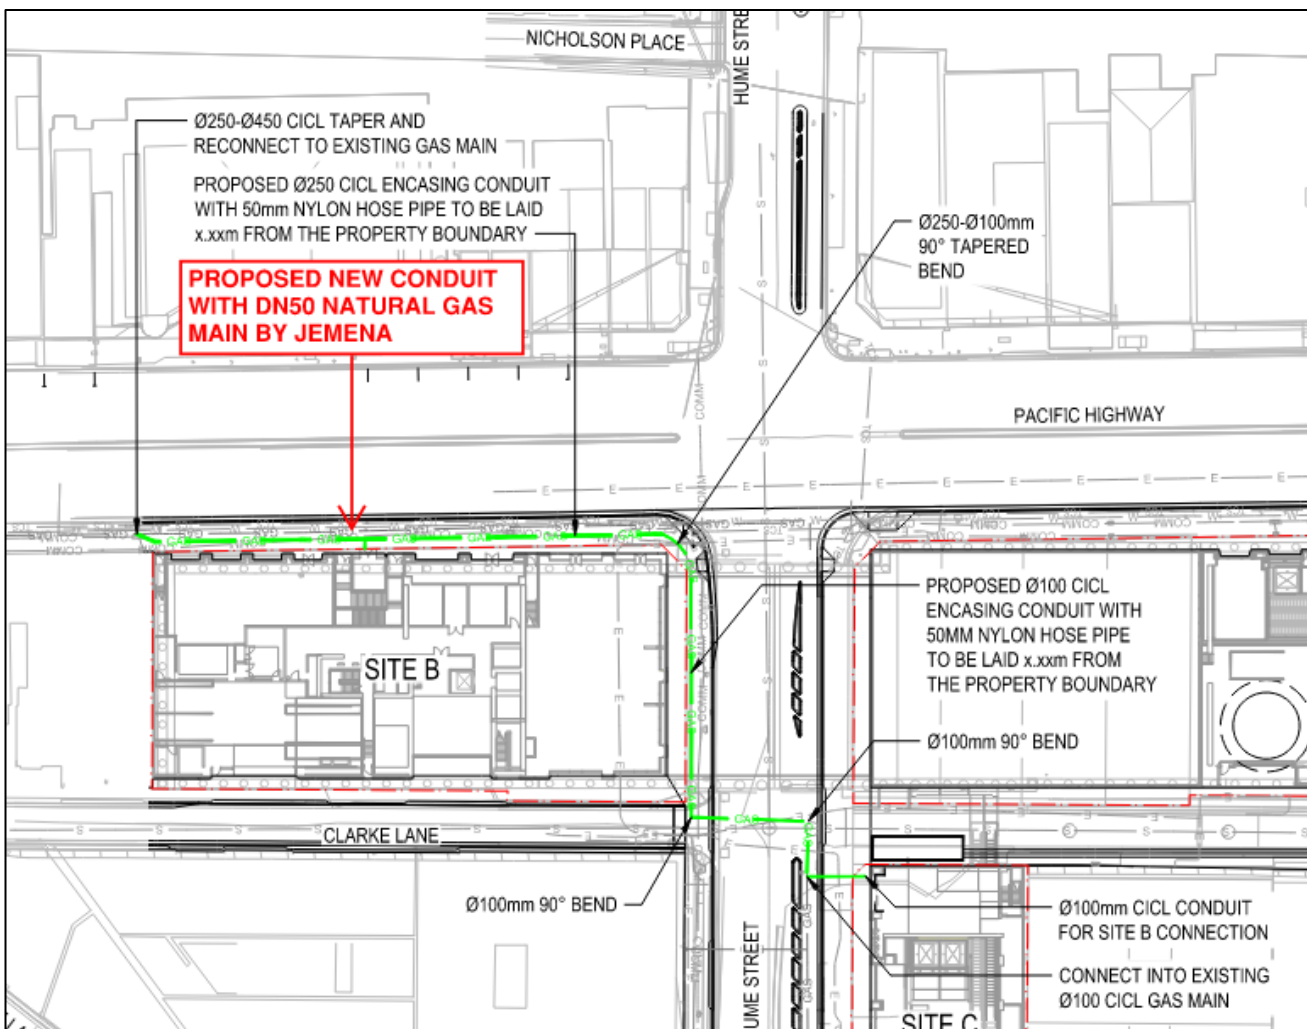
Sydney Metro Crows Nest – Proposed Utilities Plan – showing proposed new DN50 Jemena gas main
